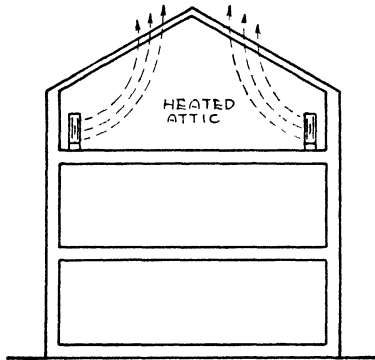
Section through Building Showing Heated Attic: Heat Flow through Roof Structure; No Heat Flow through Top Floor Ceiling
